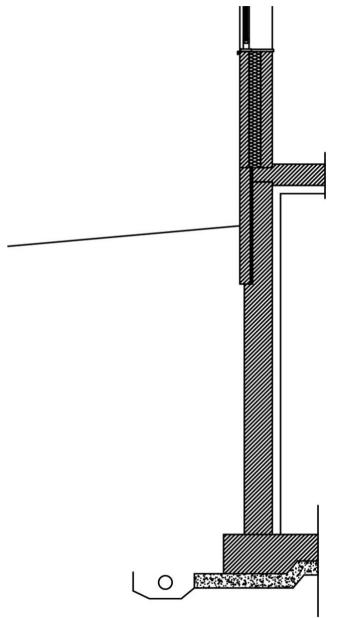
The detail of the construction of the basement floor with the drainage pipe and the load bearing concrete facade.
